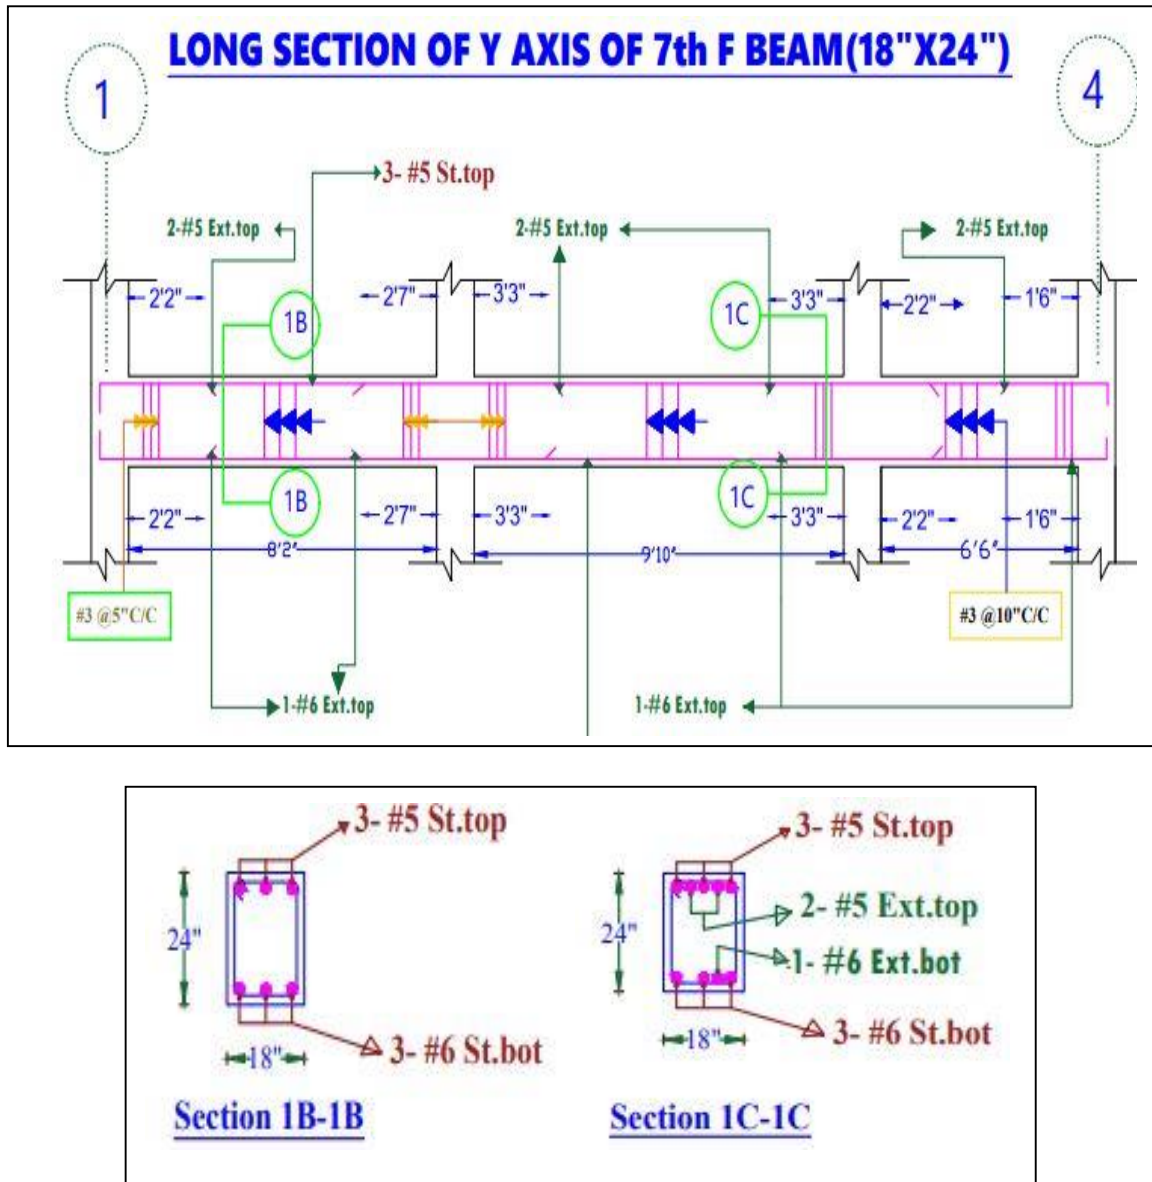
Beam Detailing & Cross Section of Y-axis
